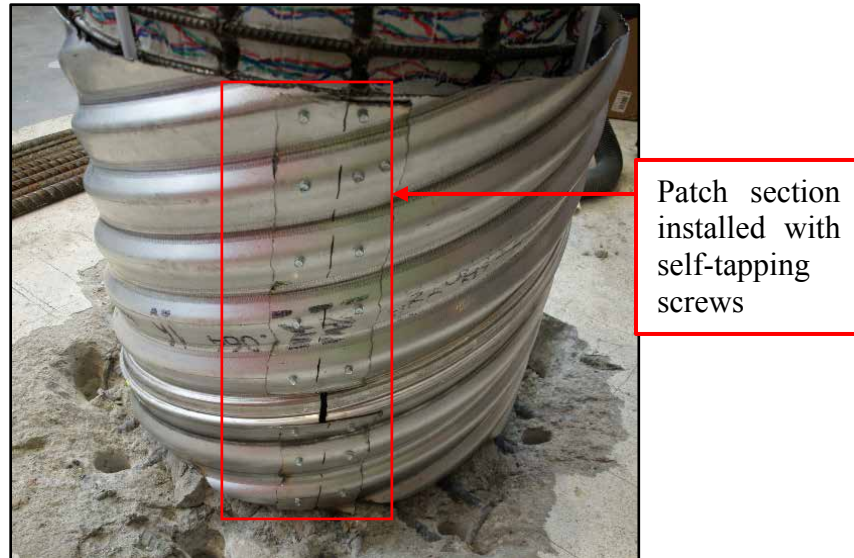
Corrugated steel sleeve shear key mechanism installed on column base.
